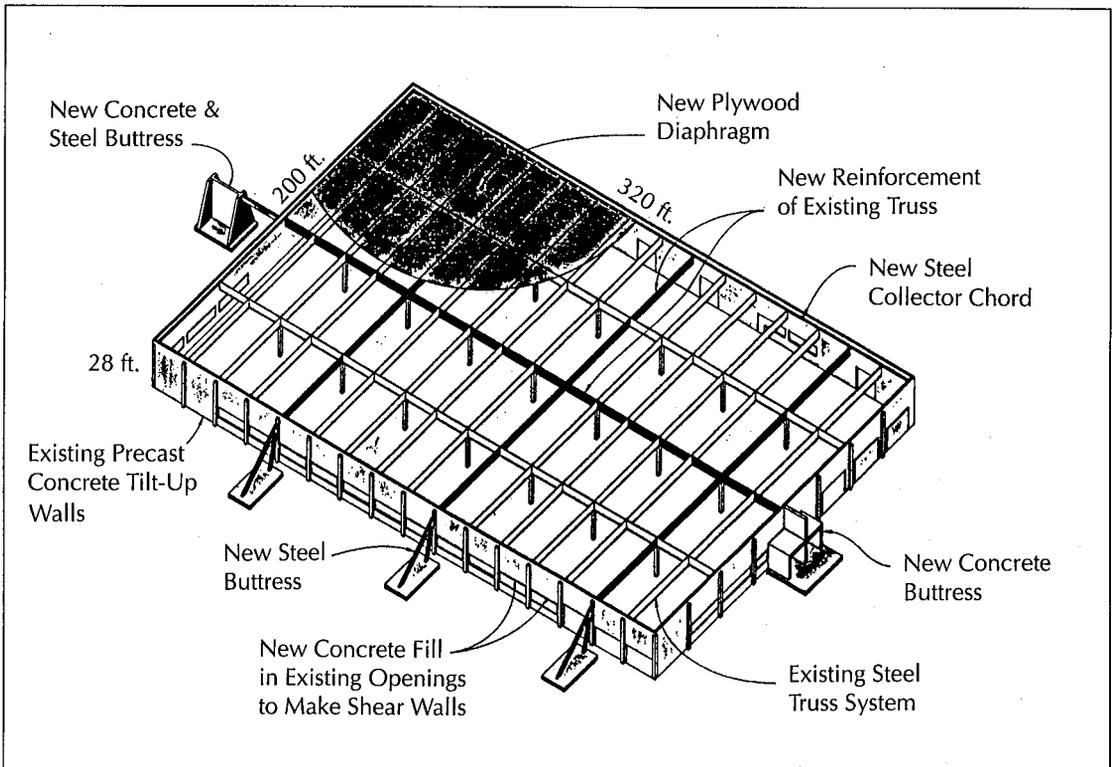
Schematic view of the seismic bracing for IBM Building 001.
